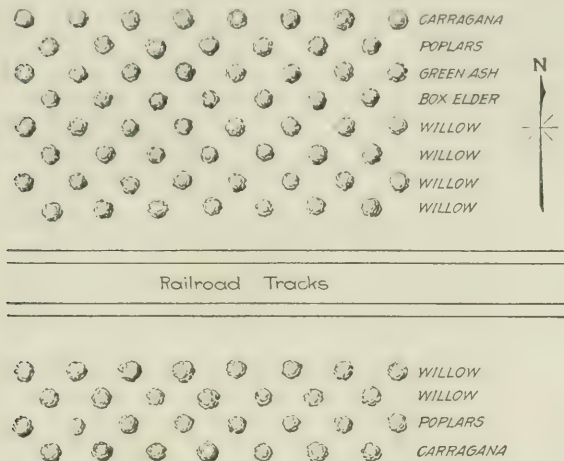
PLANTING PLAN FOR WIND BREAKS FOR RAILWAY CUTS
